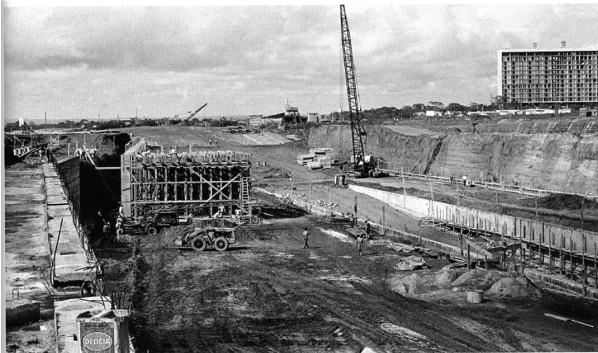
Historic picture from the end-of-construction building of the Paulista Company ([2])
